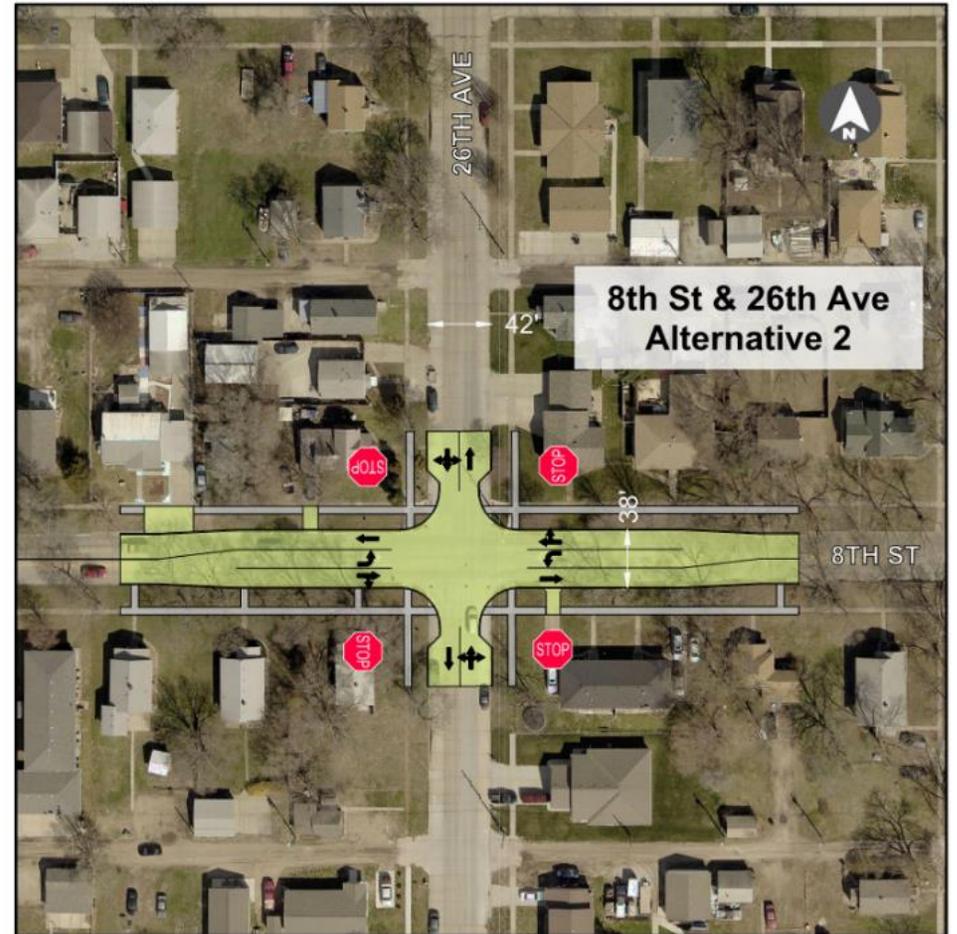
Alternative 2 – 26th Avenue & 8th Street
